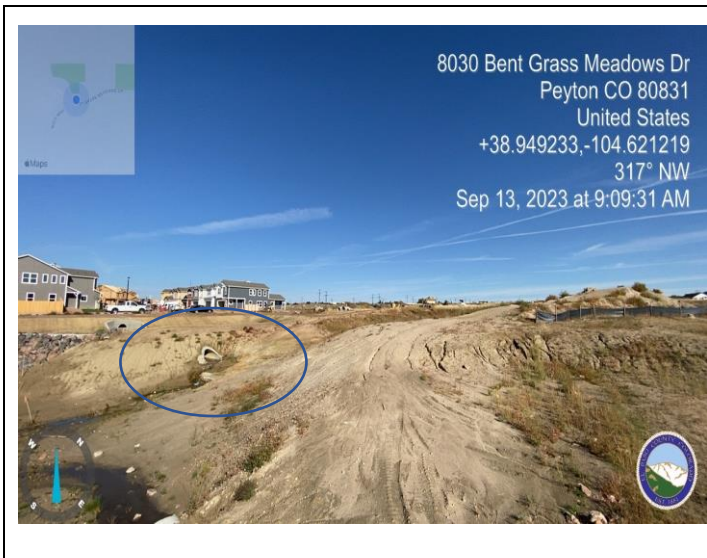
Install drop structure and other improvements in main channel (West of Swale B). See GEC Plan Sheet G7.02.
